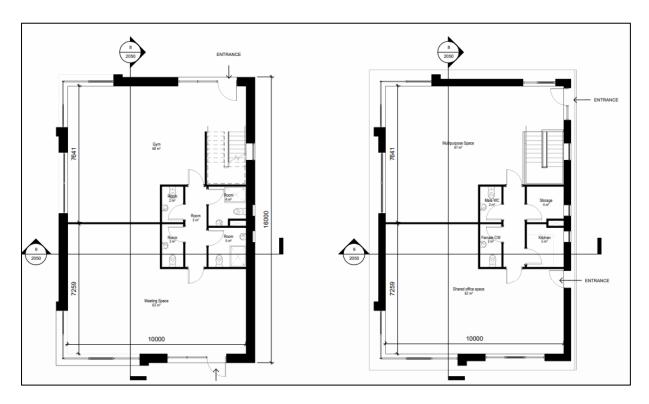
Proposed ground and first floor level of proposed communal/community building.
